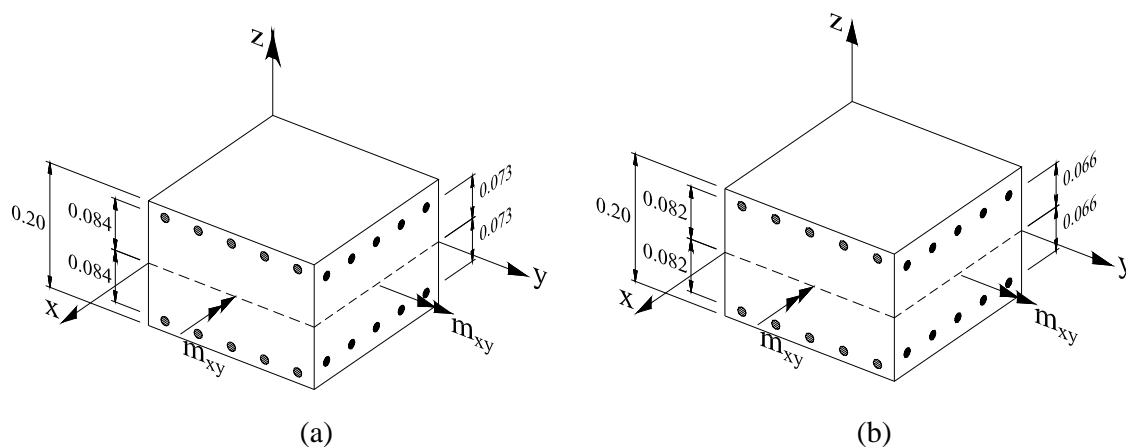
Location of reinforcement: a) Test ML7; b) Test ML9.
